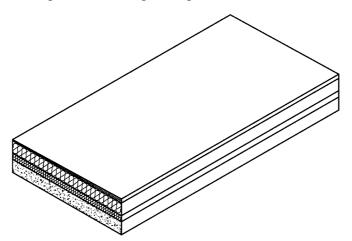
Vertical section showing the normal build-up of a flat roof using a concrete deck and rigid insulation boards
